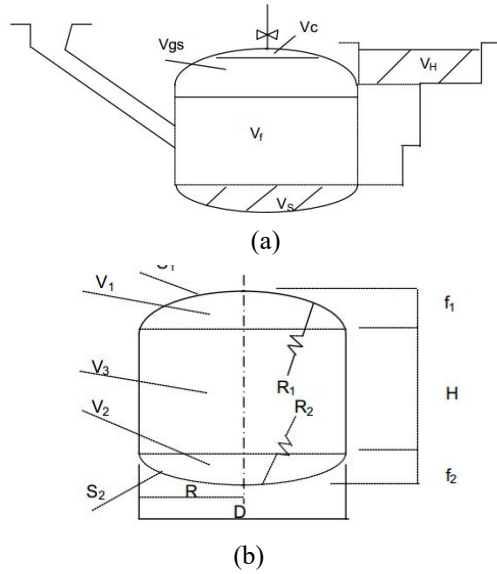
(a) Cross-section of a digester (b) Geometrical dimensions of the cylindrical shaped biogas digester Body
